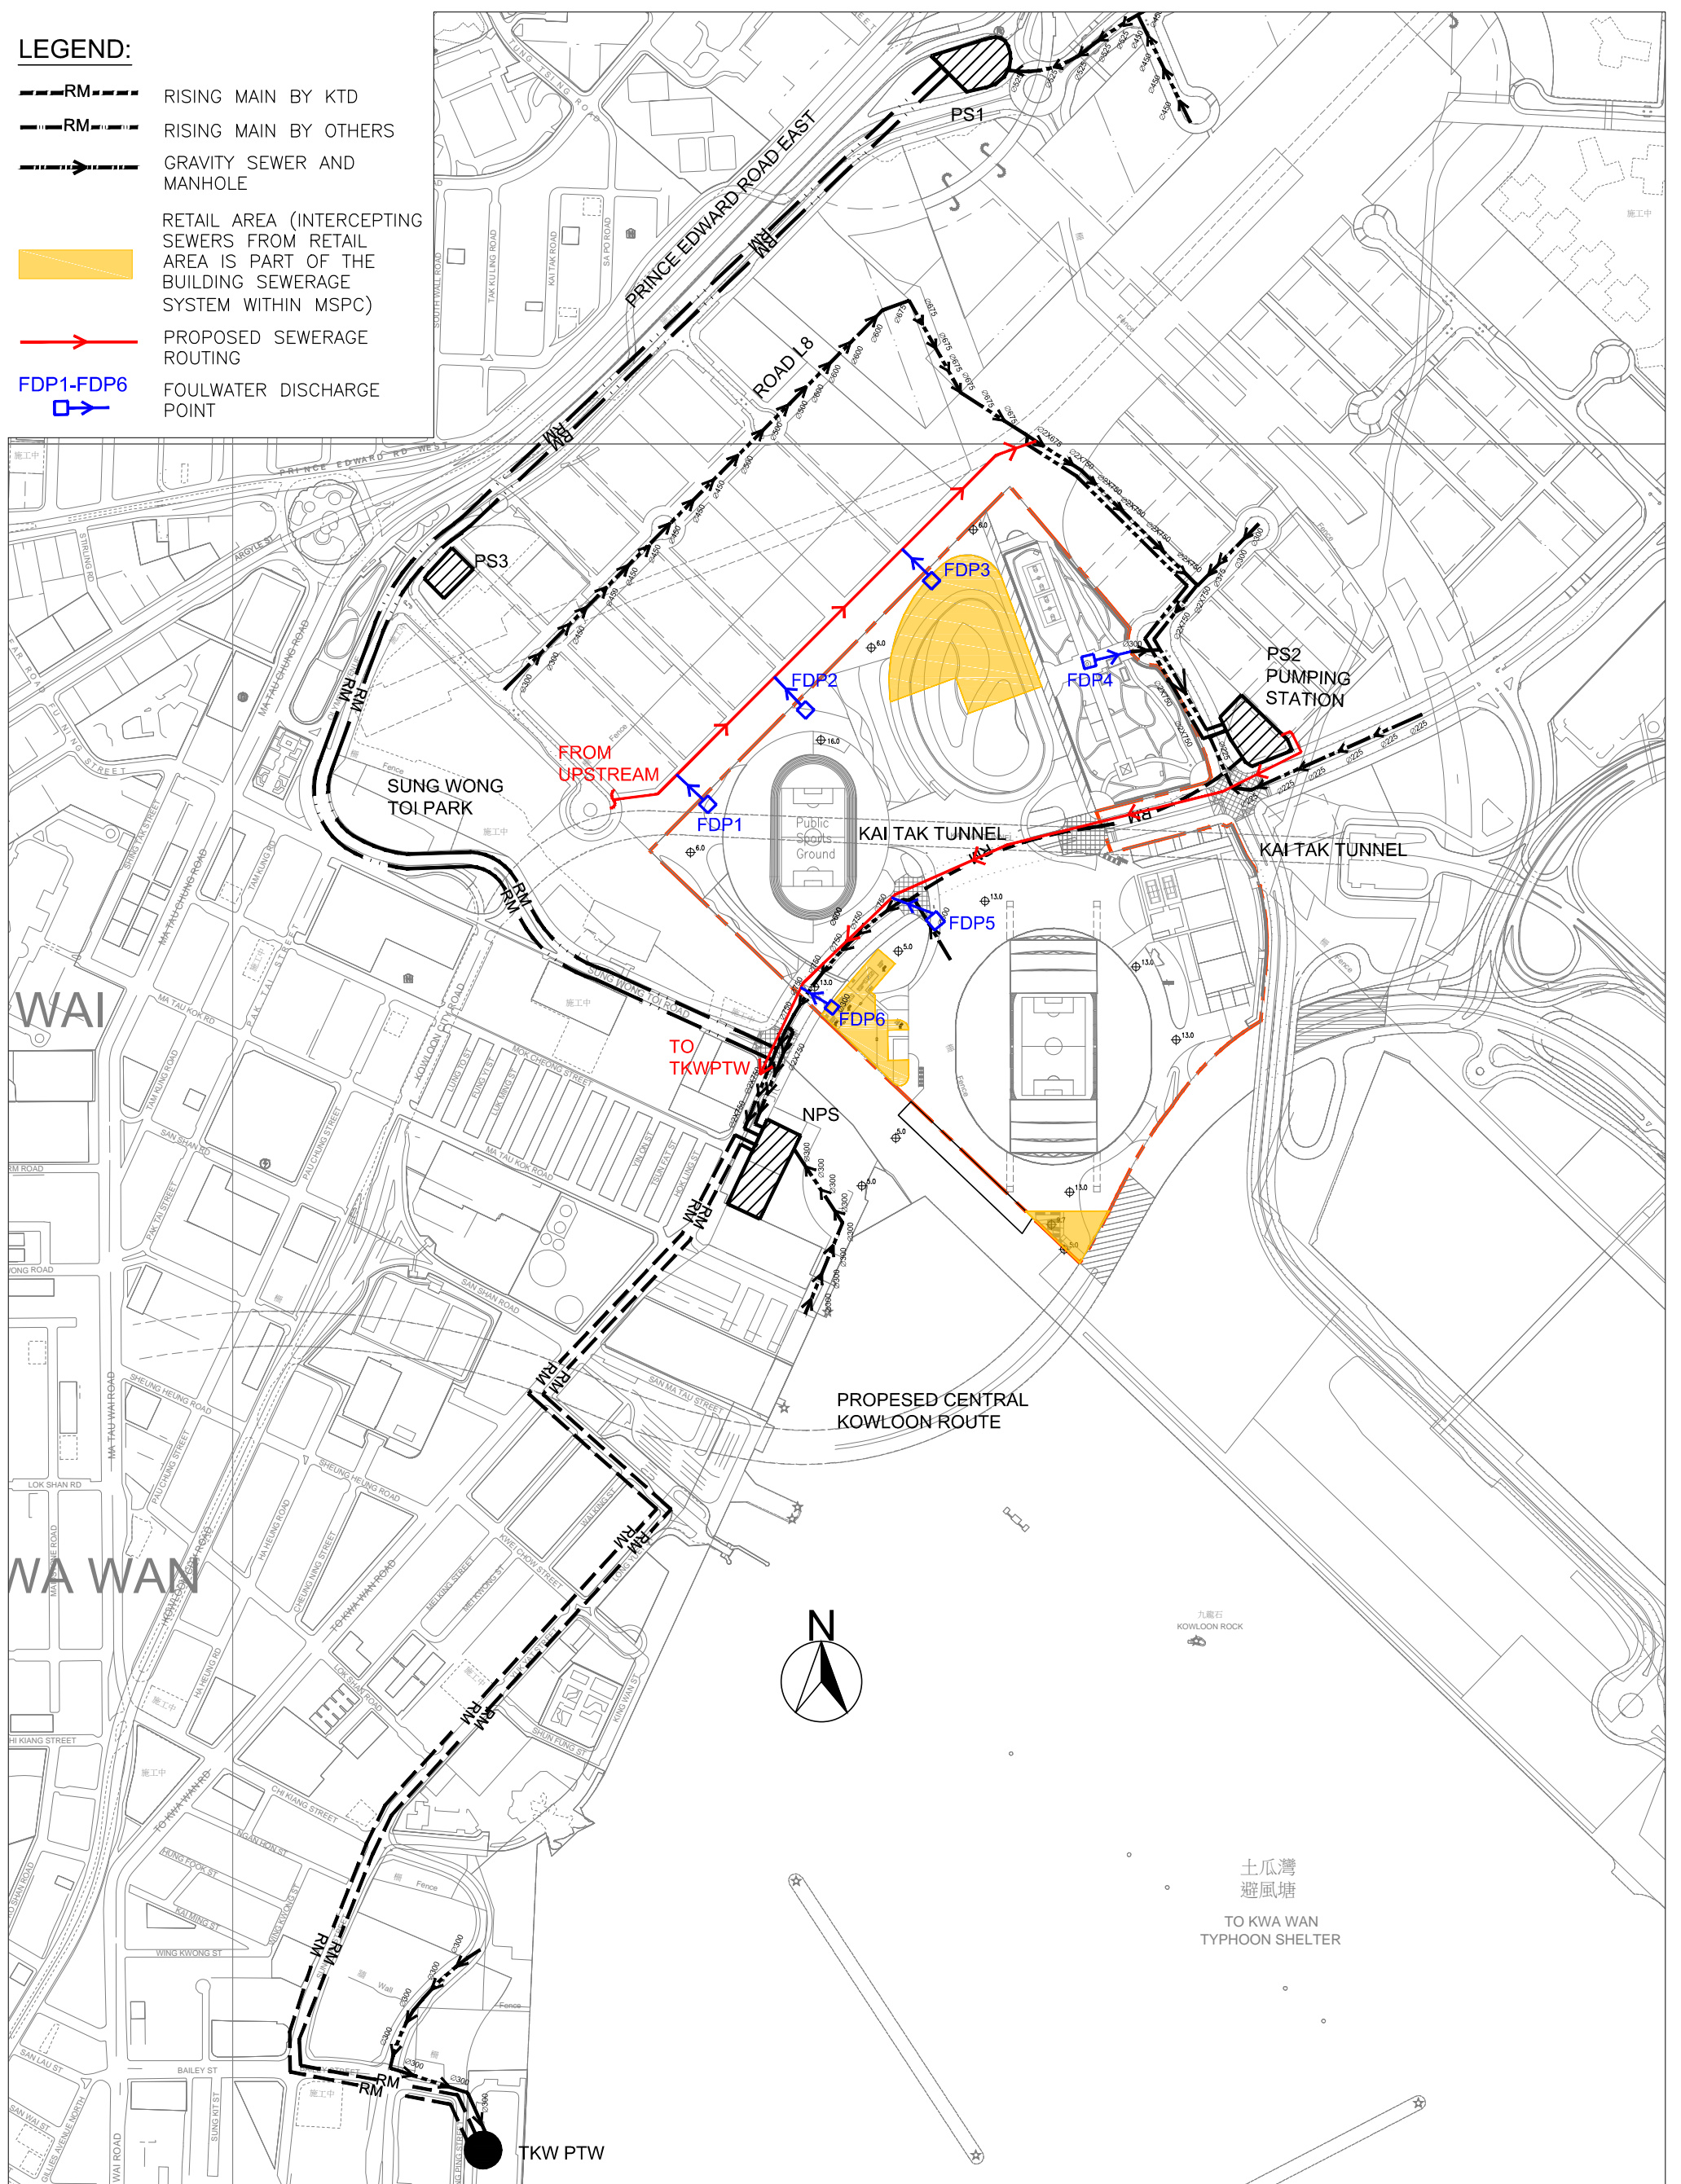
SEWERAGE LAYOUT PLAN-MPSC AND RELATED AREAS
